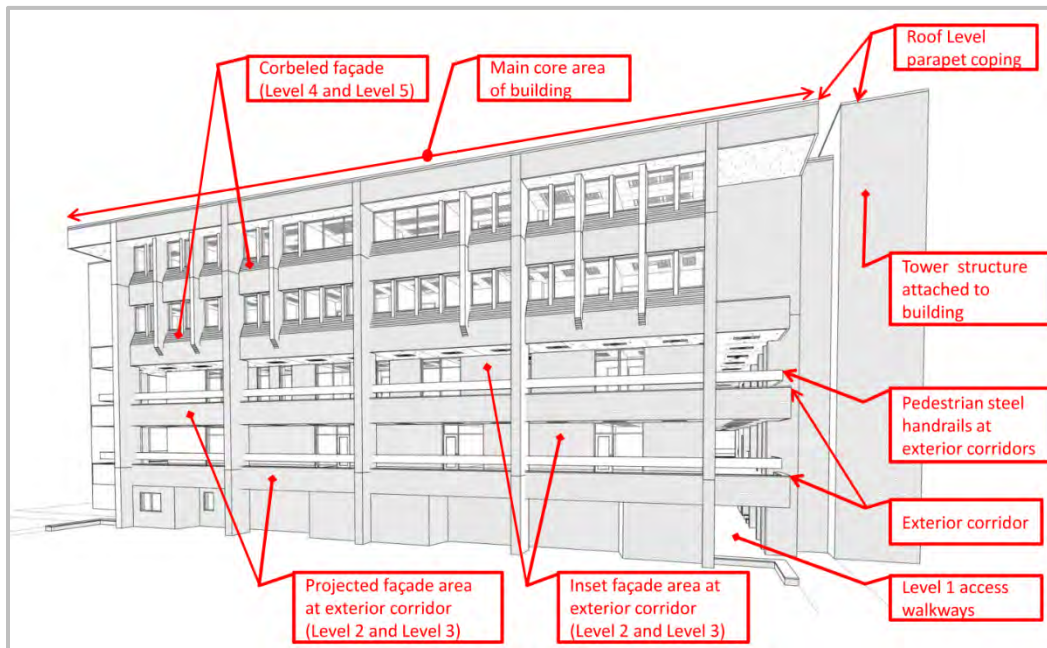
Representative elevation of UCF Colbourn Hall (north elevation as shown)
